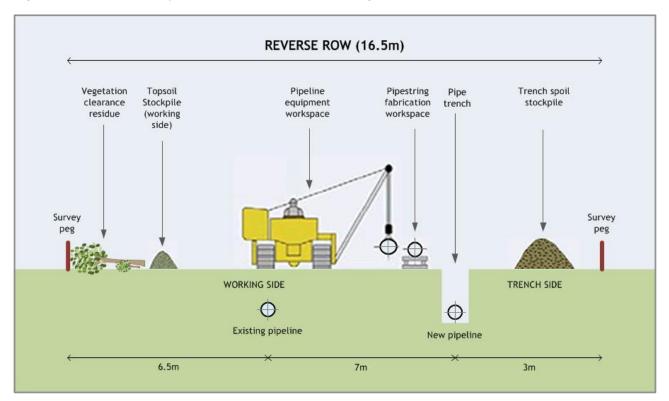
Construction layout for the reverse ROW through Chiltern - Mt. Pilot National Park.
